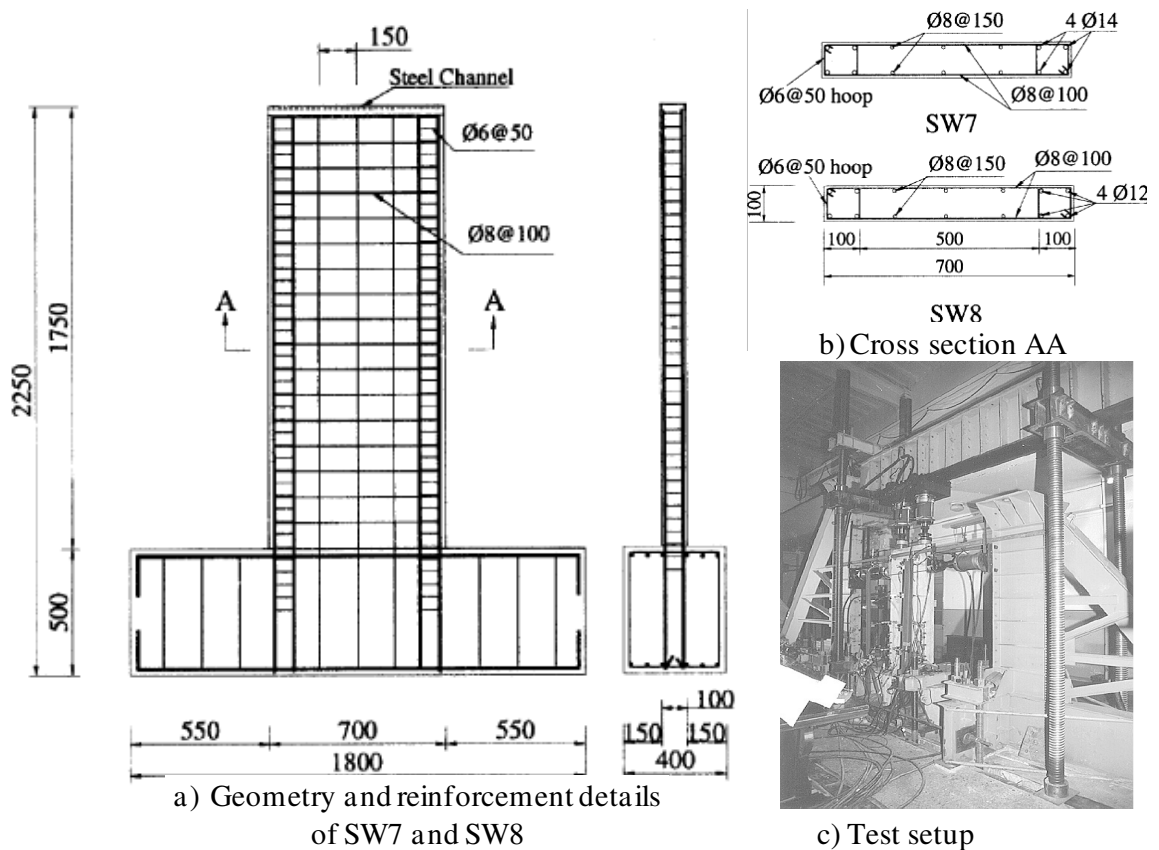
Reinforcement details of the SW7 and SW8 (Zhang and Wang, 2000)
